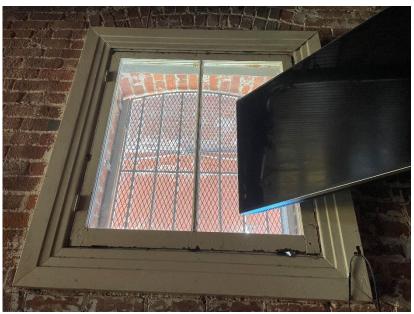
View of typical wood casement window at first floor, west wall. (Photo taken by P&T 03/14/2025)
